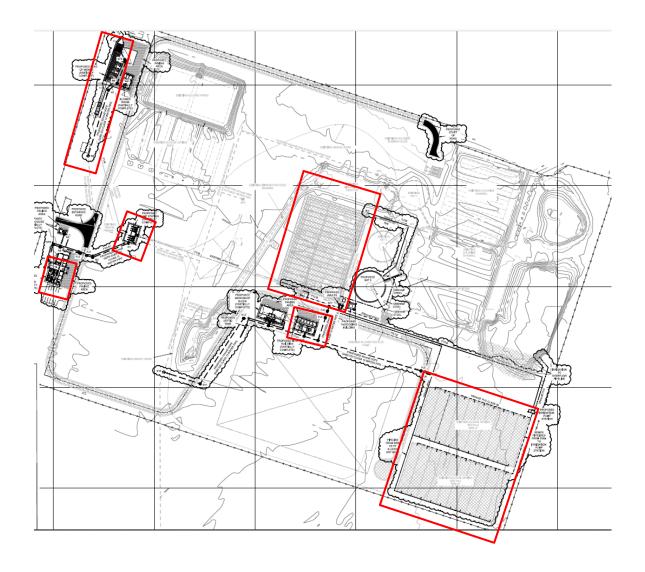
Site Plan of Gibb Designed Buildings and Structures
